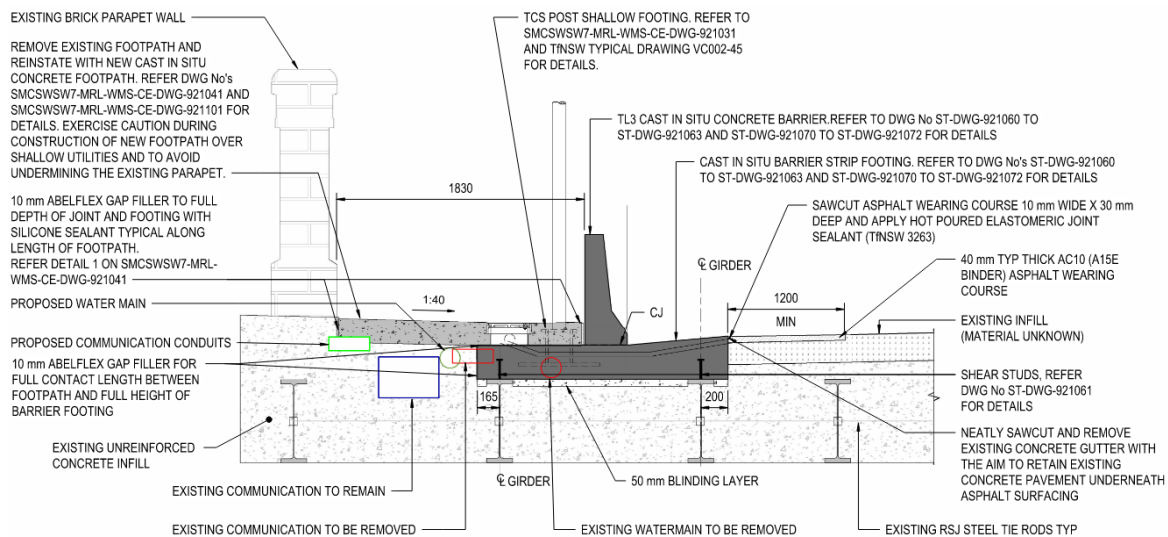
Cross section of the proposed countryside footpath behind type-f barrier
